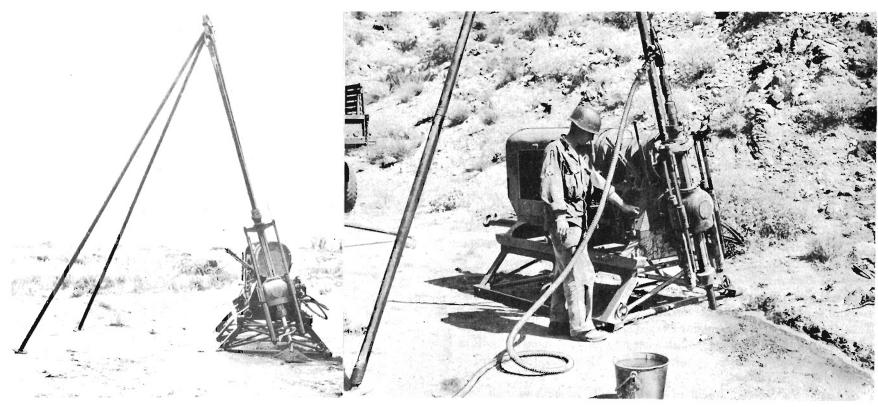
Lightweight rotary well-drilling machine. Used as earth auger and core drill.
